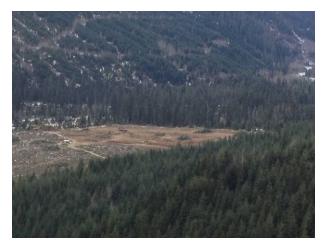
Overview of grubbing activities completed at the future construction camp location (Dec 10, 2013).
